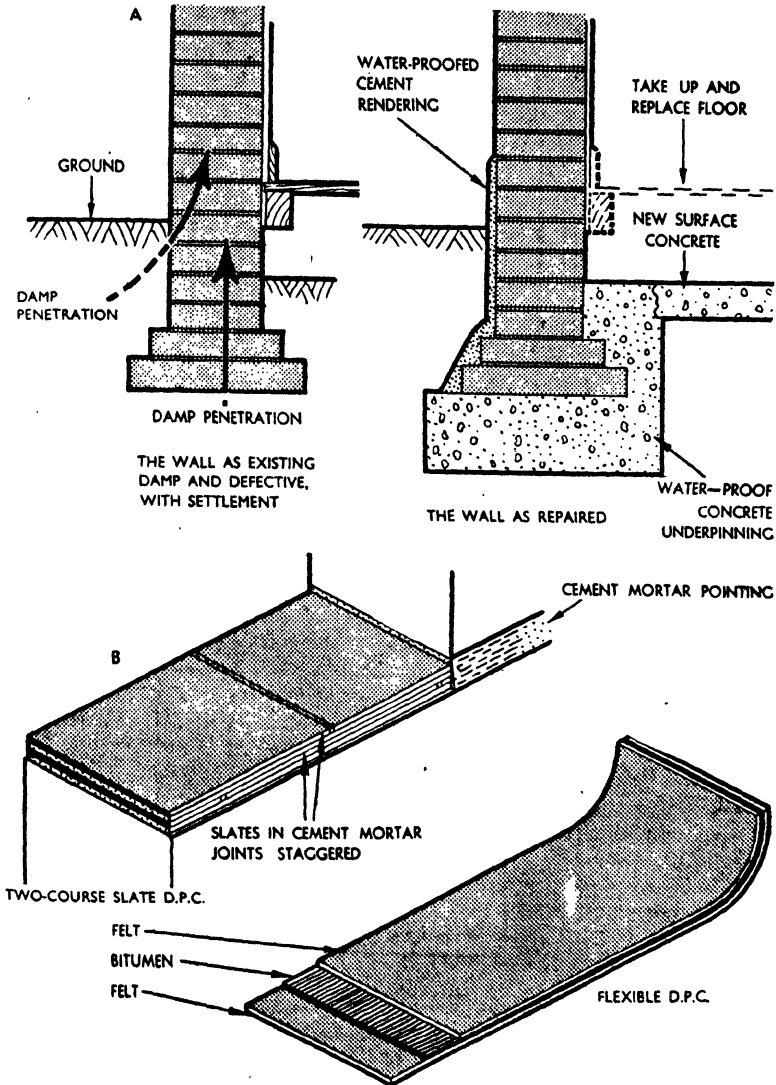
A. (Left) Old wall with no d.p.c. and defective foundation. (Right) Wall repaired by underpinning with waterproof concrete and placing a vertical d.p.c. on the outside of the wall. B. Examples of rigid and flexible d.p.c.'s.
